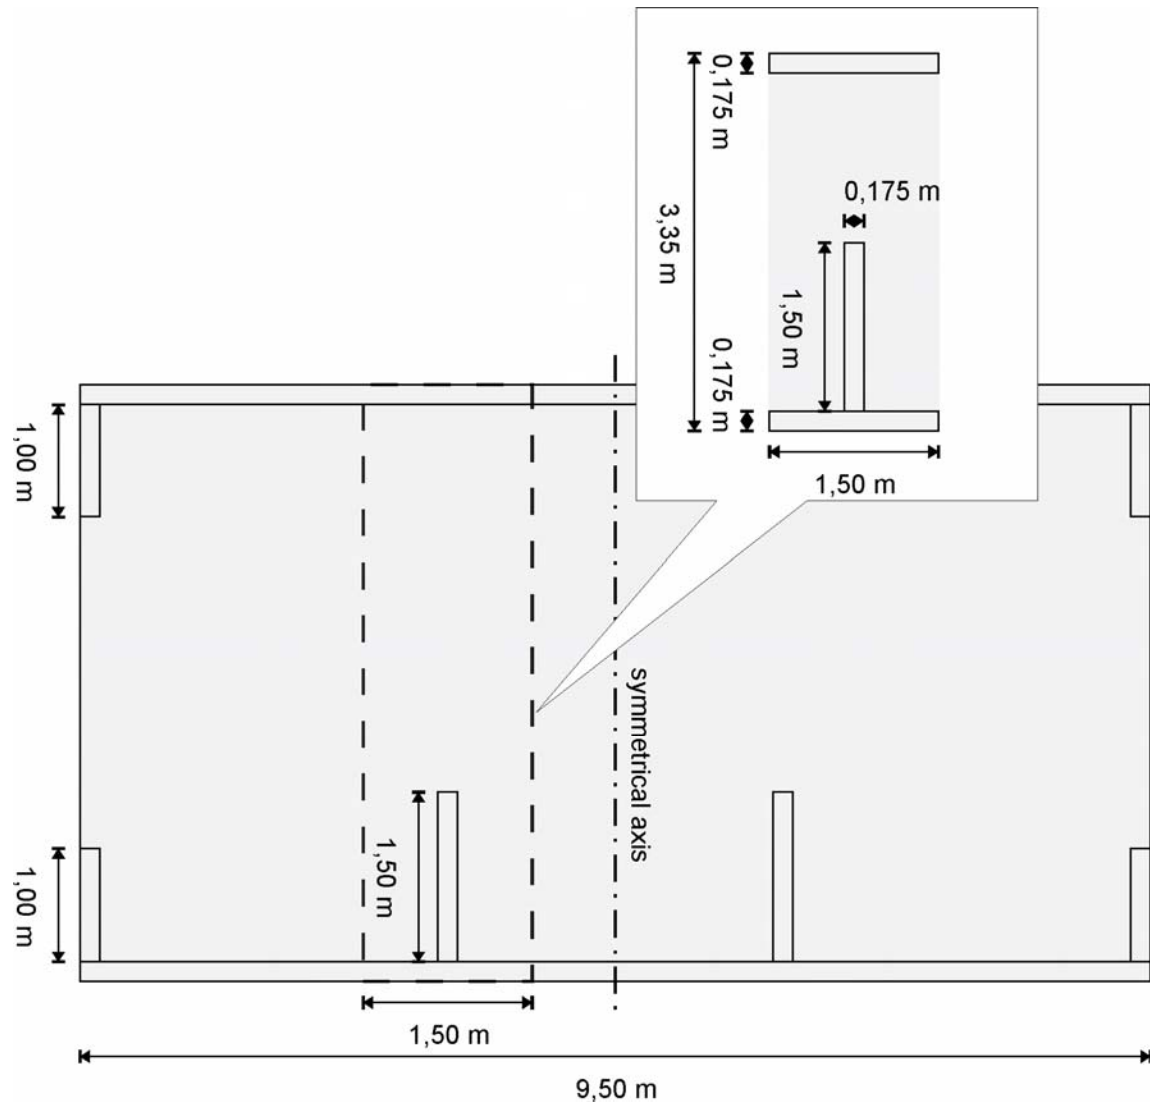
Ground plan of a typical two storey terraced house in Central Europe and cut-out of the tested specimen
